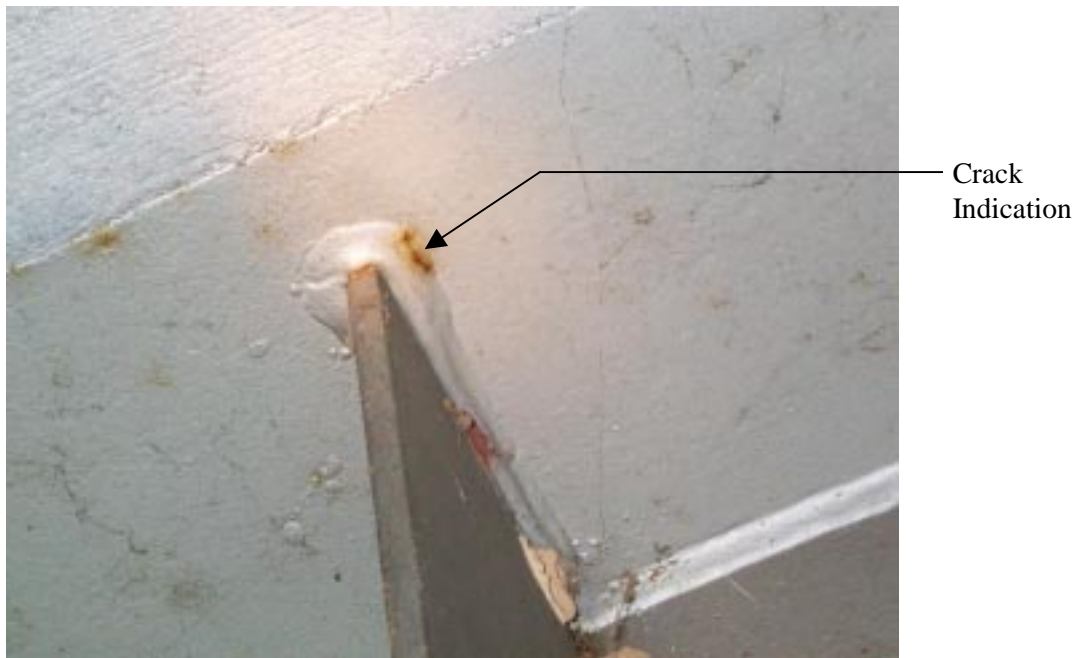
Weld crack indication W4 at vertical stiffener-to-top flange connection.
